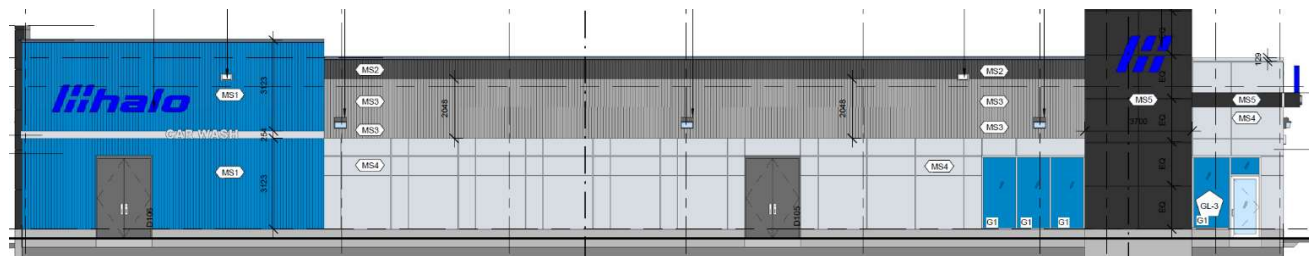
Exhibit P: North Elevation of the Building demonstrating the varied materials, colours, the articulated roofline and the corporate branding
